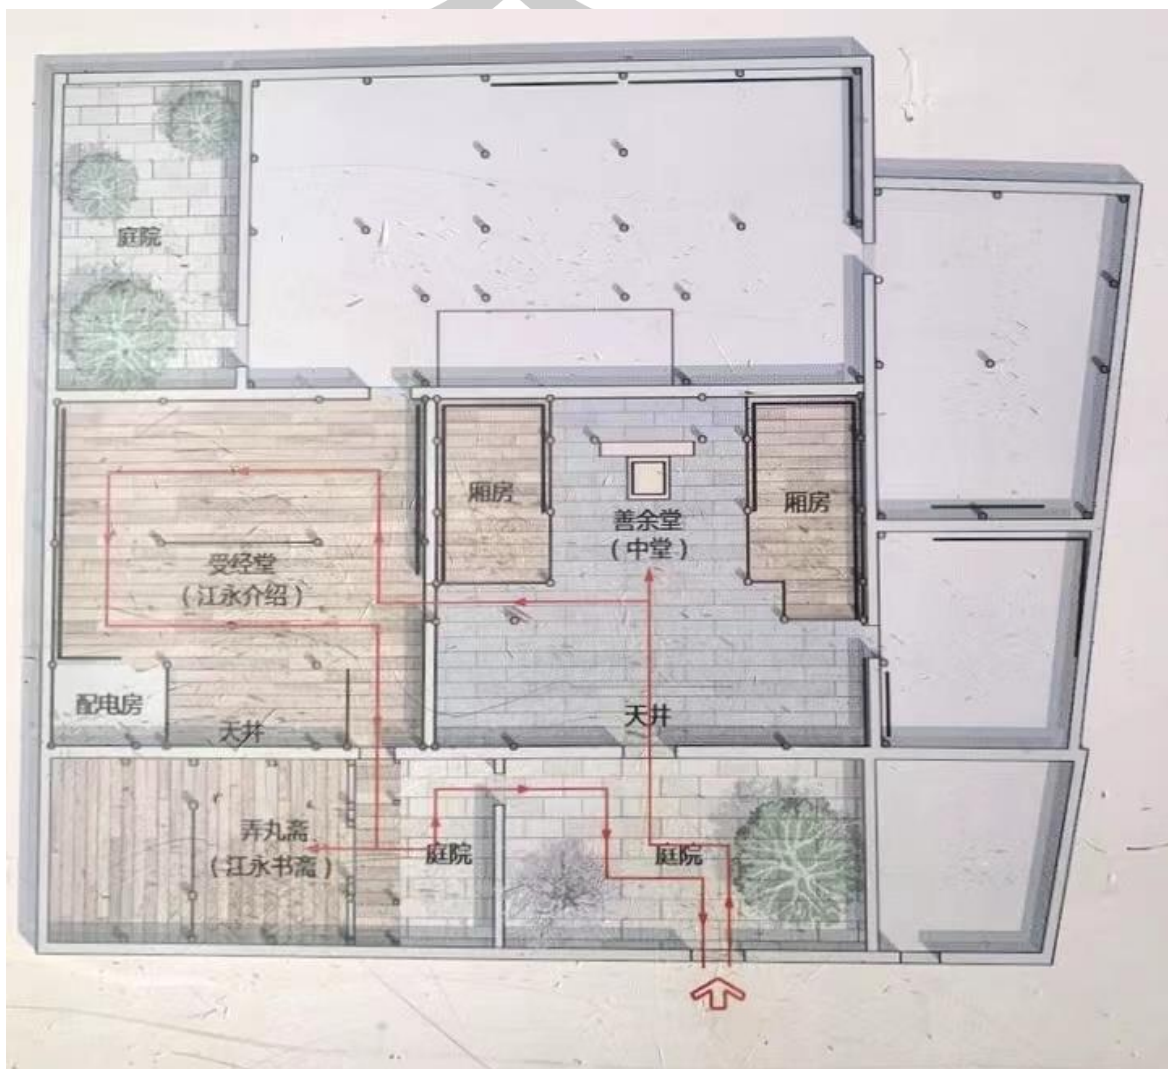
Floor plan of Jiangyong's former residence in Wuyuan
